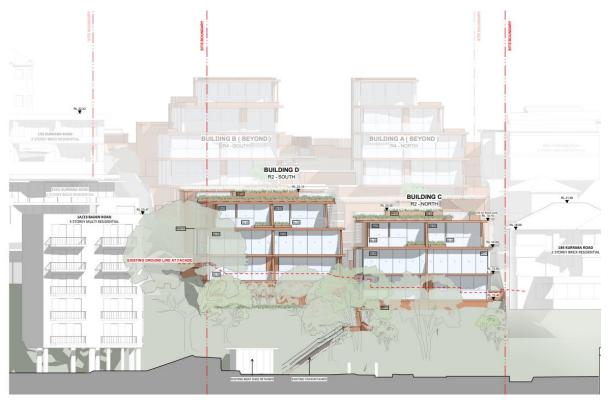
Drawing A201 - East Elevation (Source: KTA)
